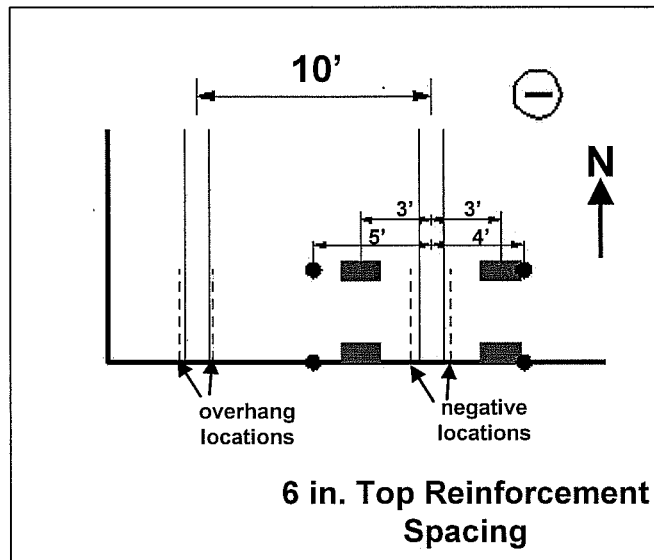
6-in. top reinforcement spacing, negative-moment region (Test Area 2)
